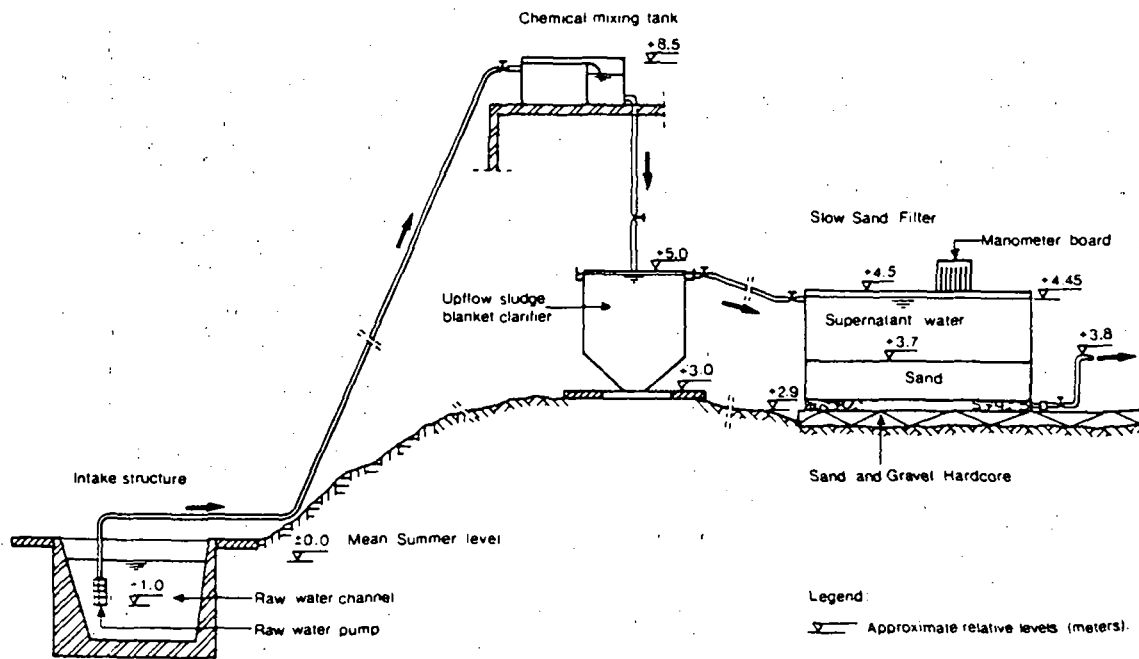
Schematic hydraulic profile of Egham pilot plant
